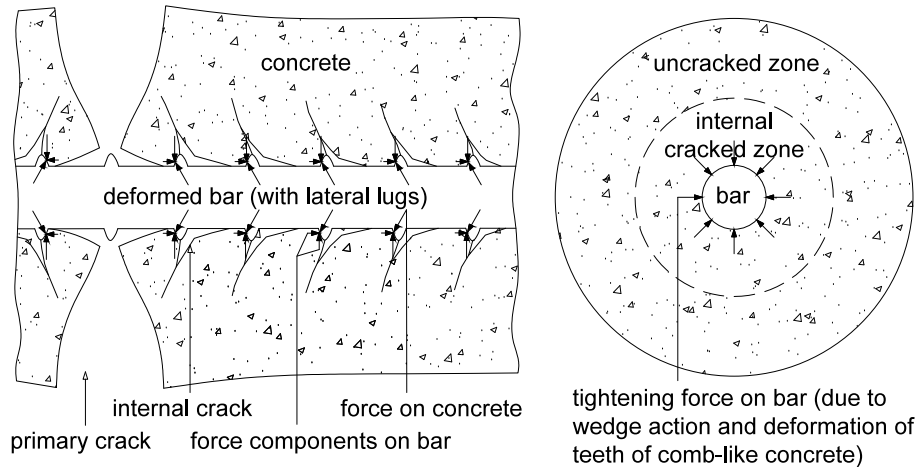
Schematic diagram of fracture in concrete during pullout of steel rebar⁷⁹
